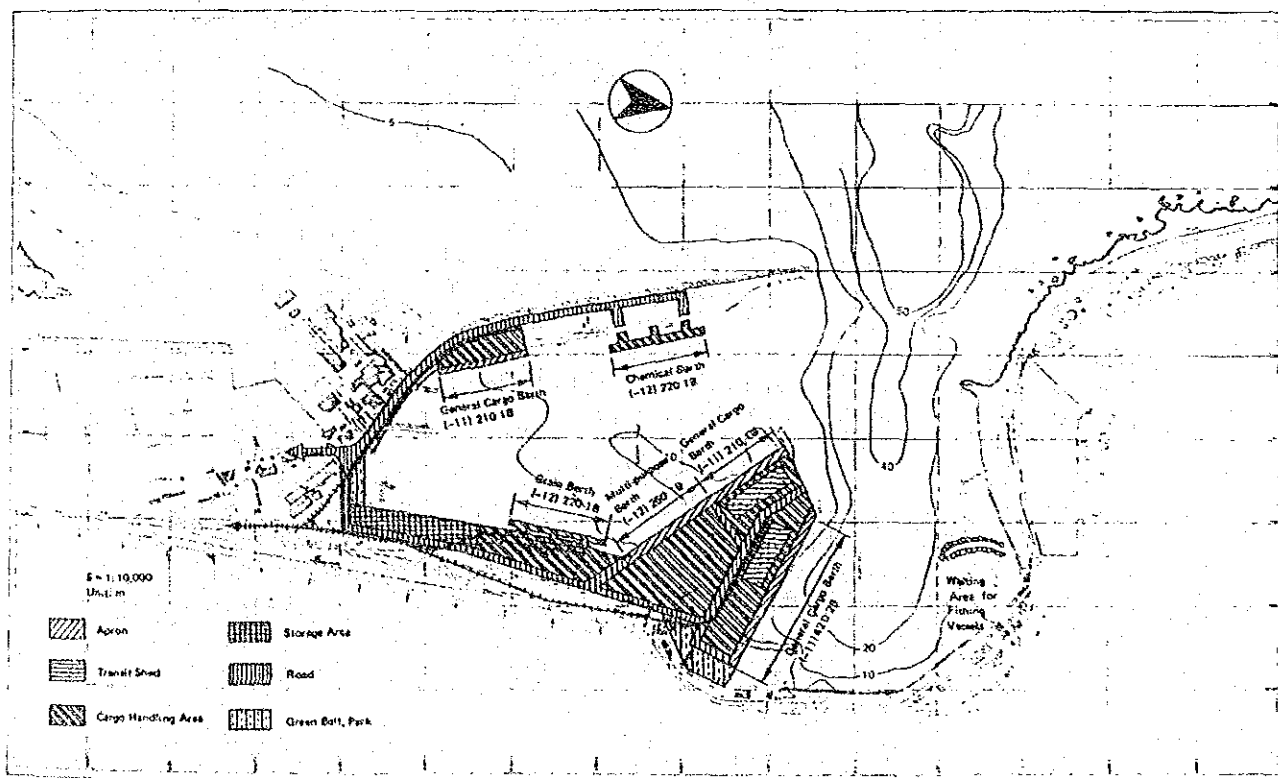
Master Plan of San Antonio Port (2010) Plan D
